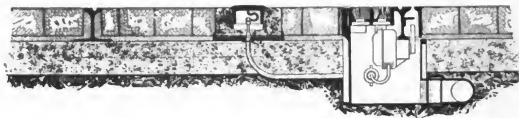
SECTION OF TRACK, CONDUIT AND STUD
